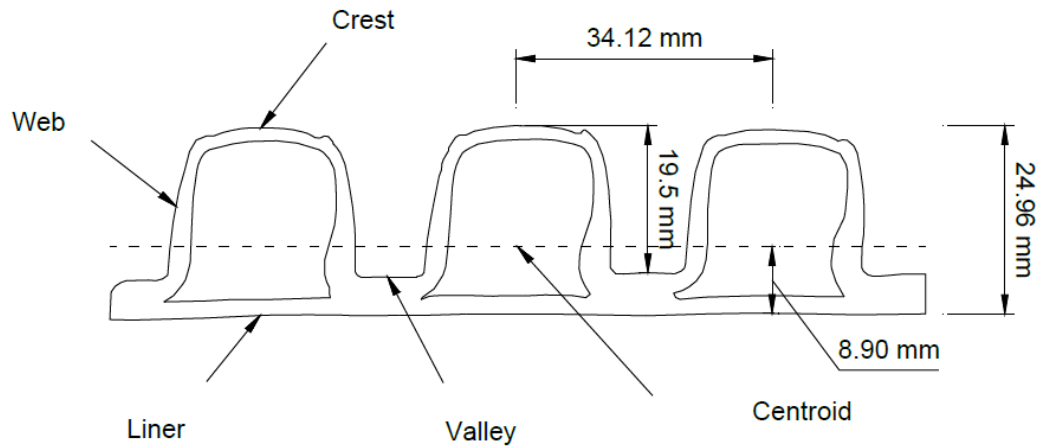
Section of HDPE wall [taken from Akinay (2017)]
